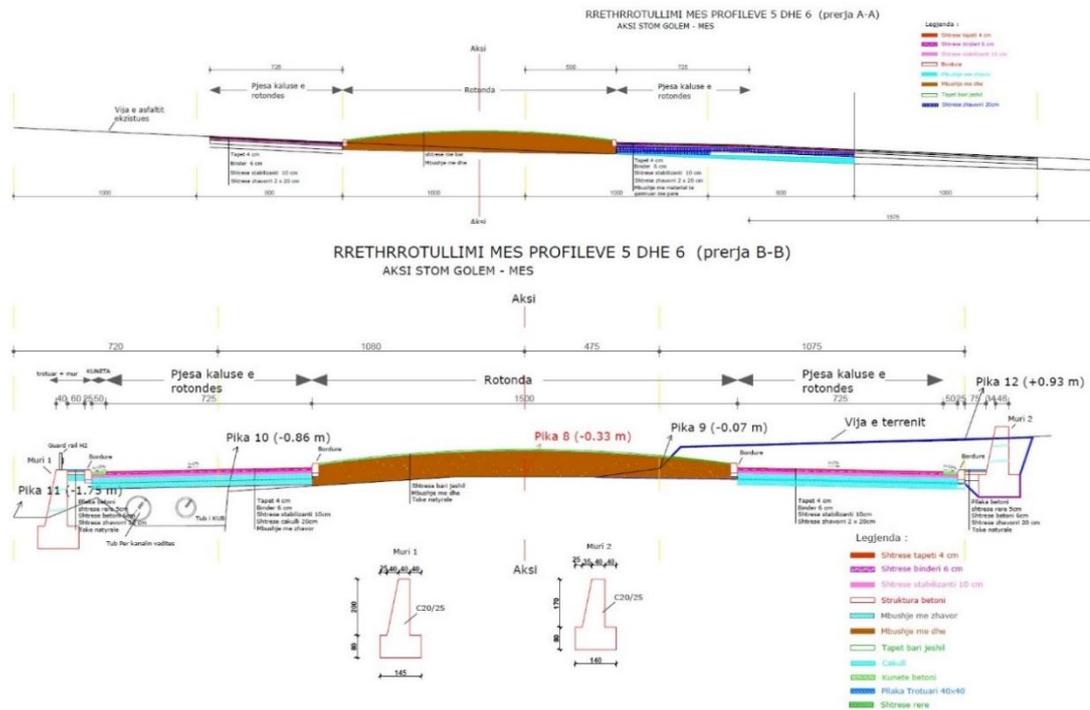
Cross sections A-A and B-B of a roundabout of the road
